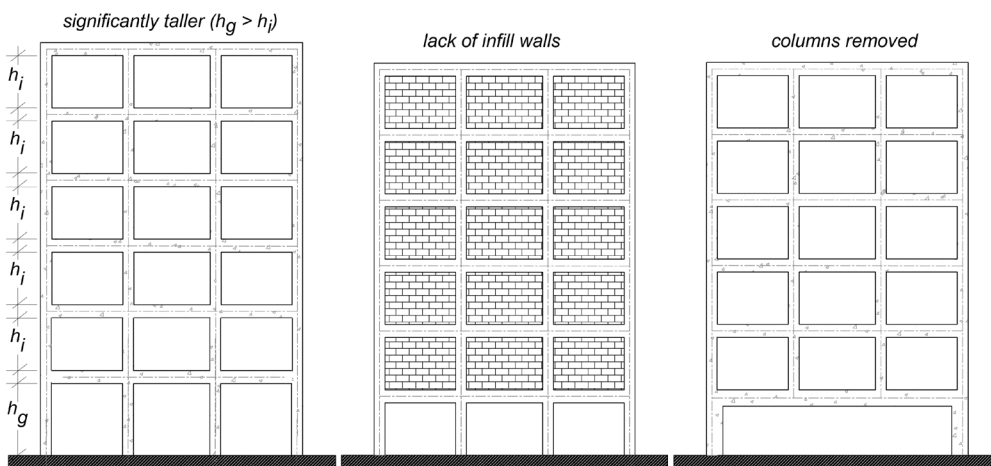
Common causes of soft story mechanisms at ground floor levels.
